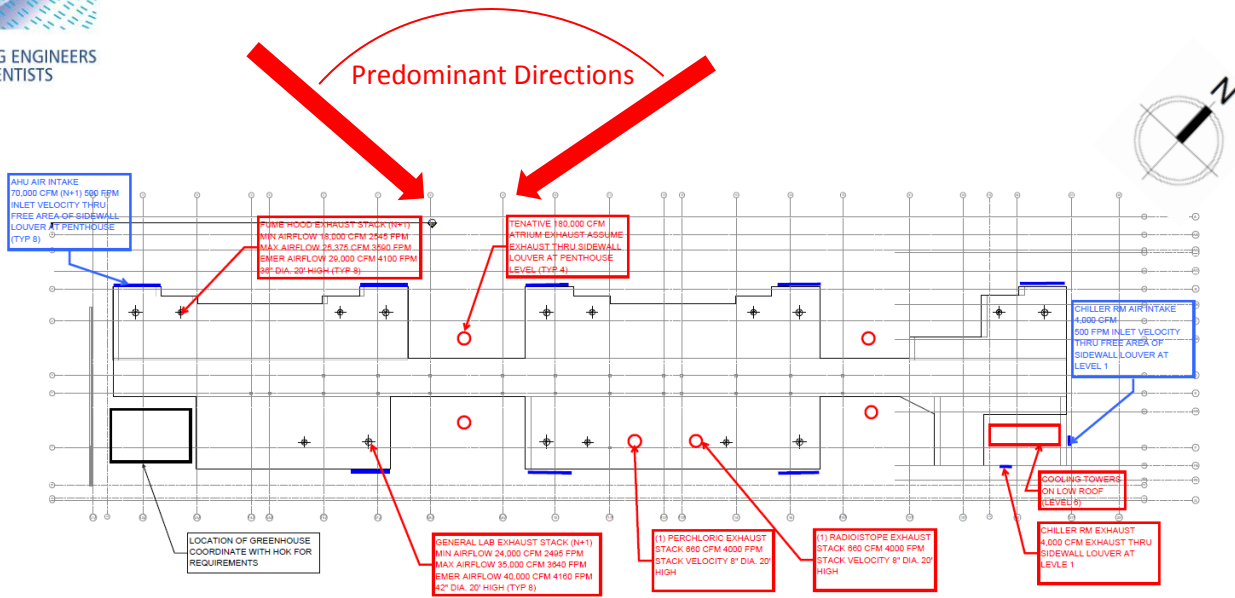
Roof Plan Showing Air Intakes and Exhausts
